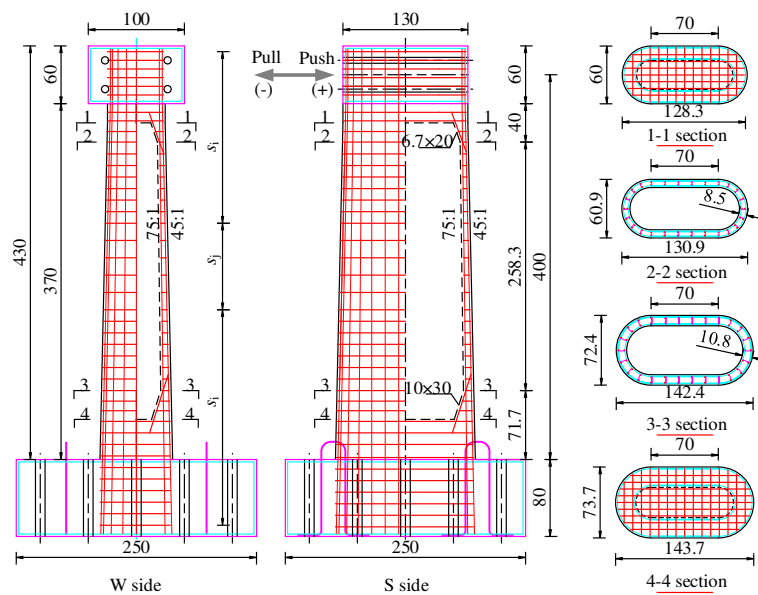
Configuration and reinforcement of the column specimens (Unit: mm).
